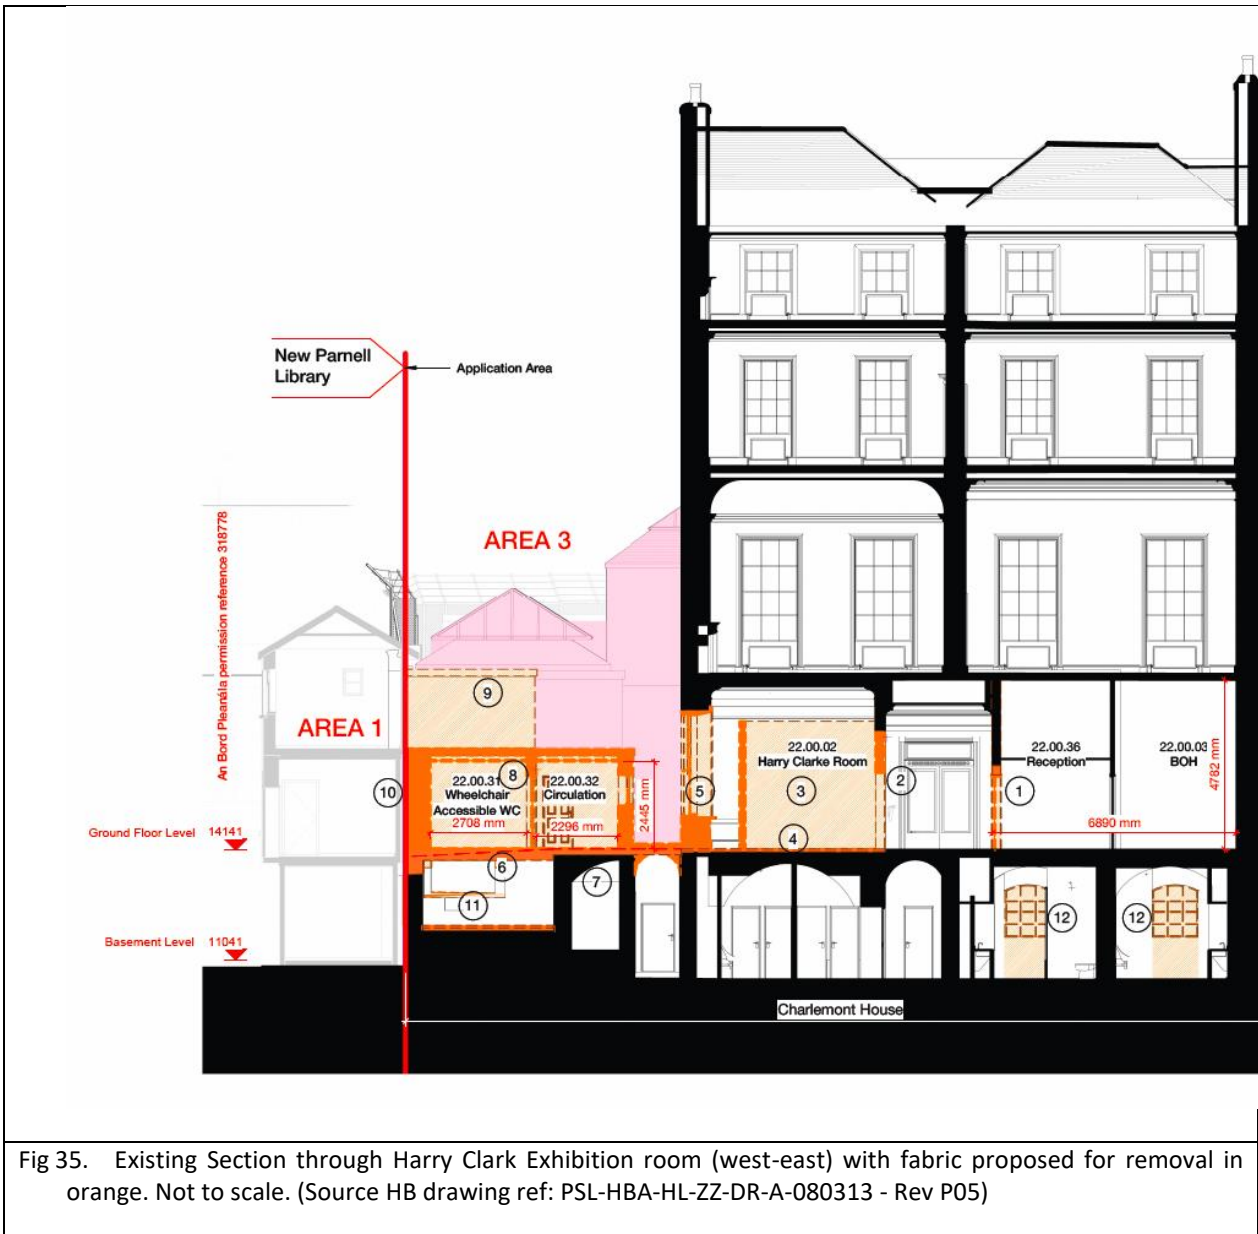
Existing Section through Harry Clark Exhibition room (west-east) with fabric proposed for removal in orange. Not to scale. (Source HB drawing ref: PSL-HBA-HL-ZZ-DR-A-080313 - Rev P05)
